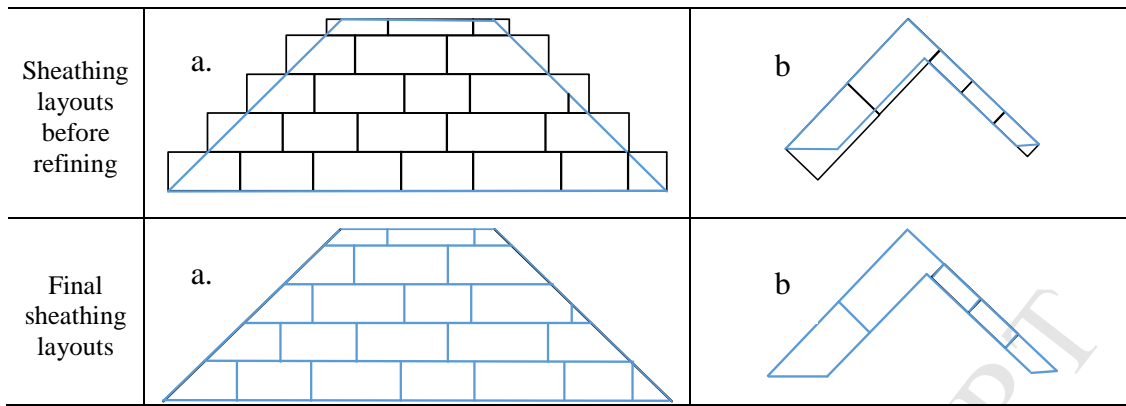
Sheathing layout design examples (top down view): a. trapezoid; b. irregular
